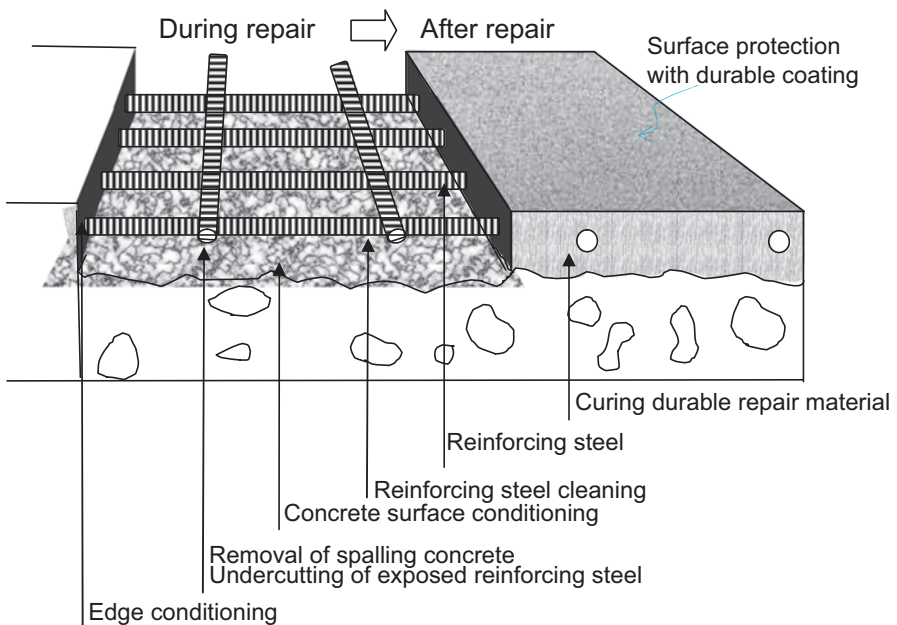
Repair of deteriorating concrete (delamination, spalling, and steel corrosion).
